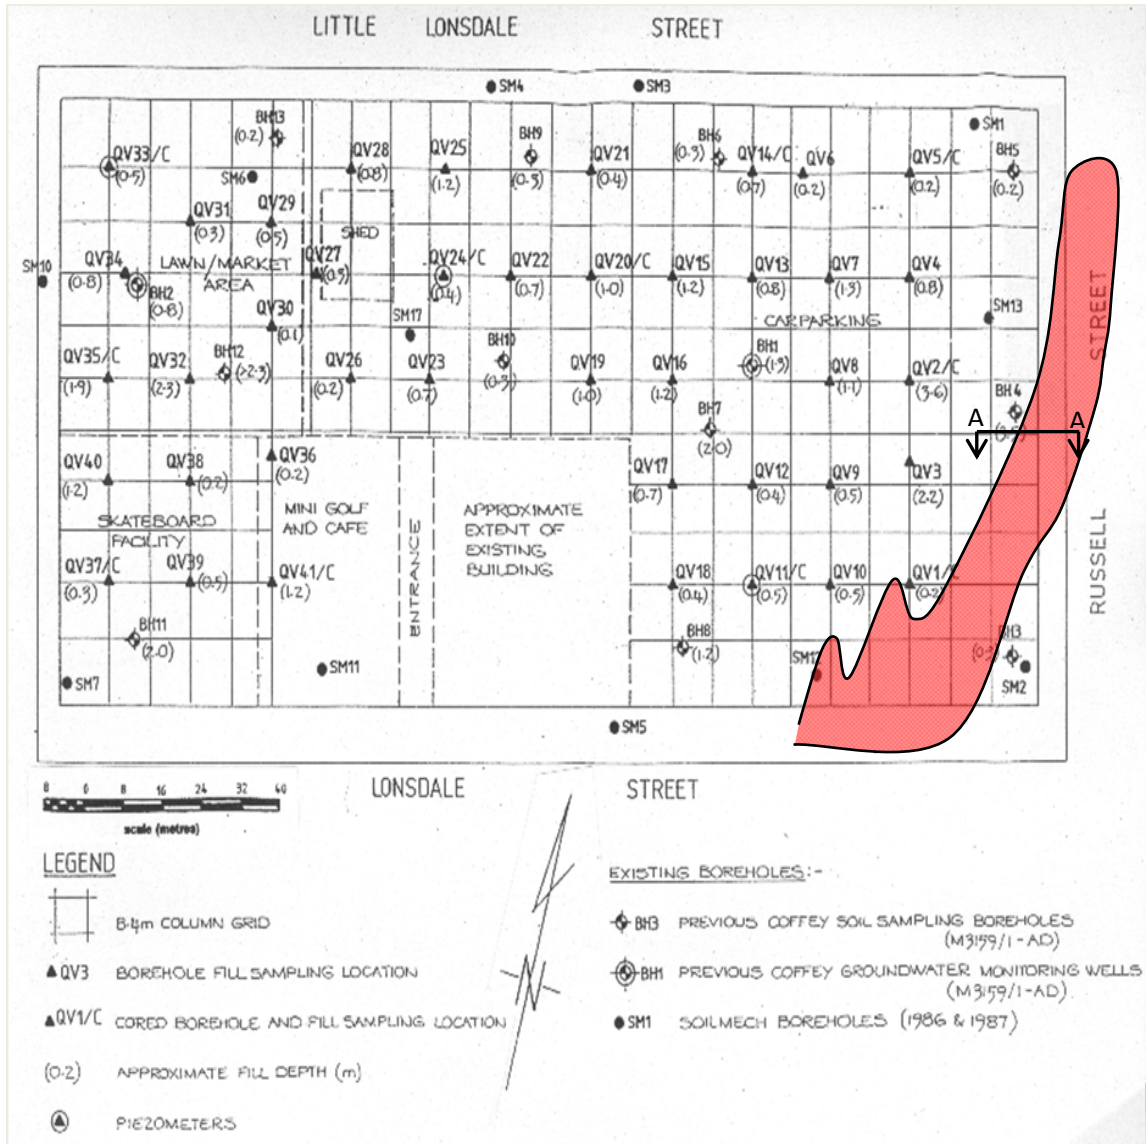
Site Plan Showing Major Dyke Intrusion – Mapped During Excavation and Hole Drilling
